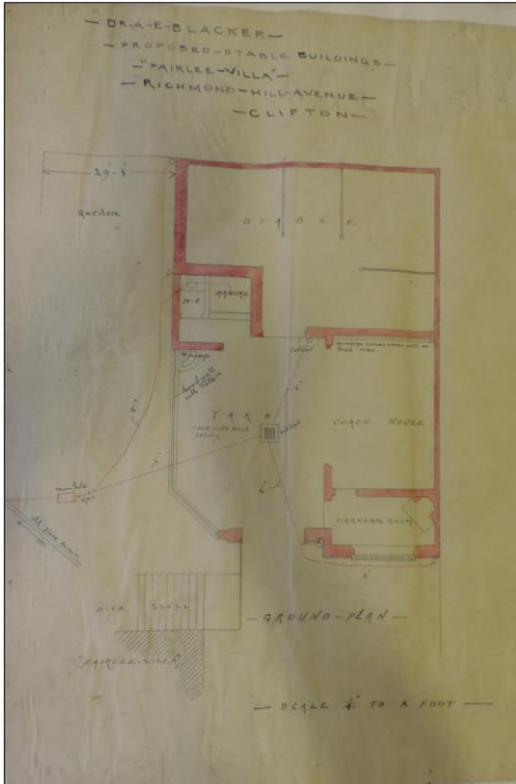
Original building plan for the proposed Stable dated 1889, commissioned by Dr A E Blacker, Ground Floor showing Coach House, yard and harness room. (BRO ref BUILDING PLAN/Vol 24/ 12a)
